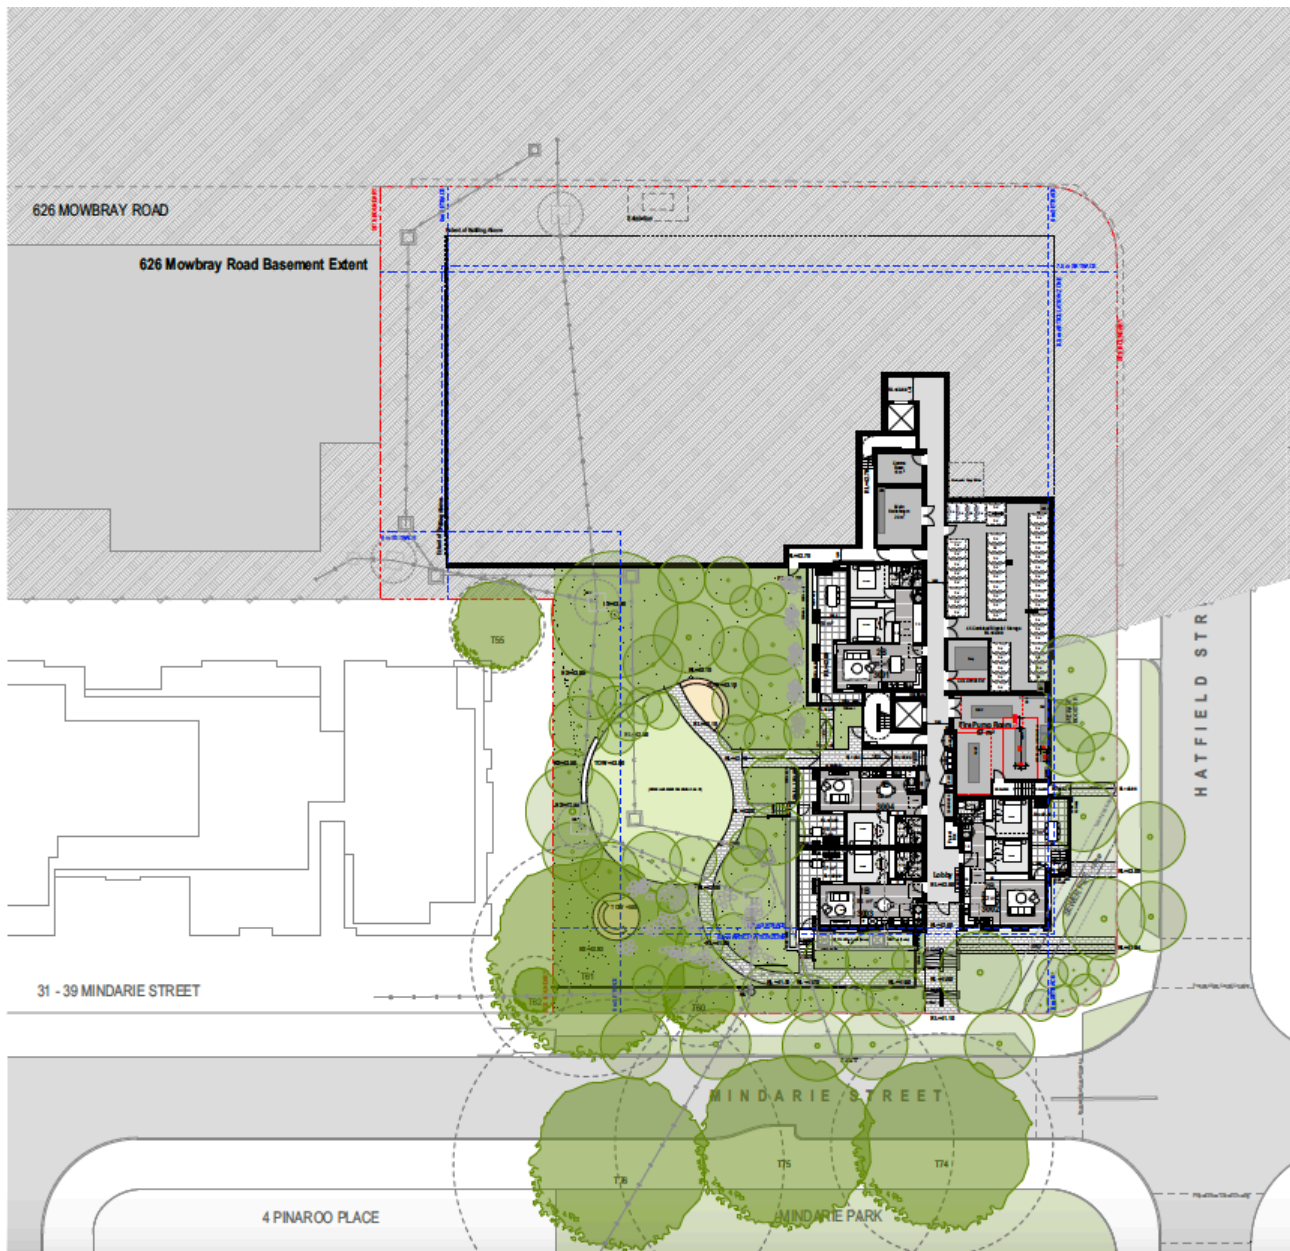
Lower Ground Floor Plan (Source: DKO Architects)
